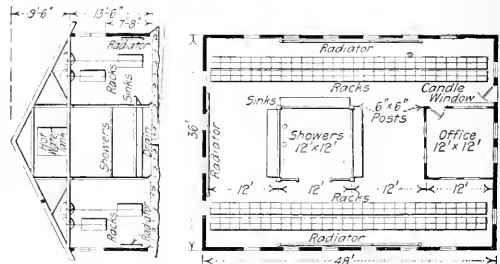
PLAN AND ELEVATION OF THE AURORA CHANGE HOUSE
